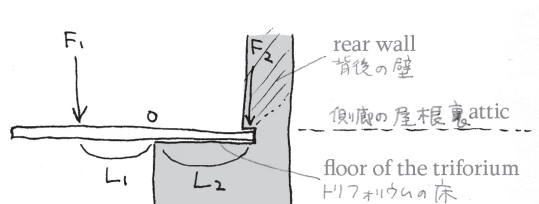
Forces acting on a putlog fixed to the rear wall of a triforium and placed on the floor
